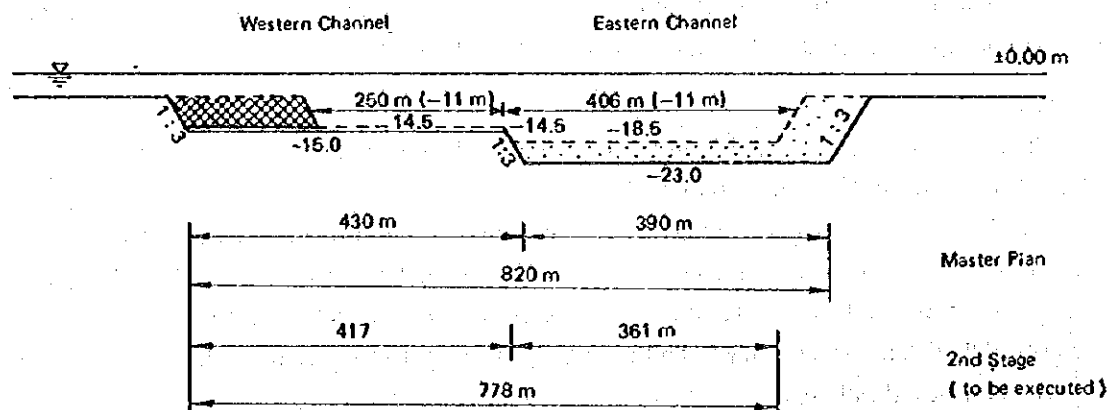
Standard Cross Section of the 2nd Stage Development Project (2)
